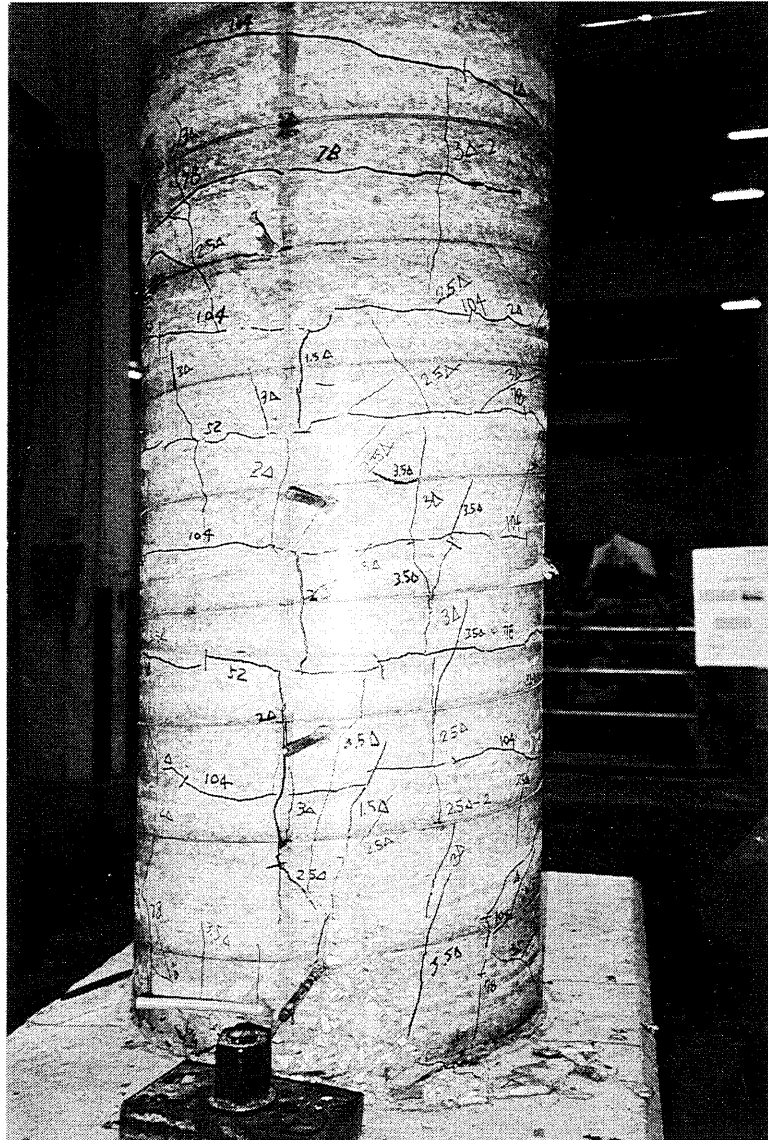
Cracks on Tension Face for Negative Loading
